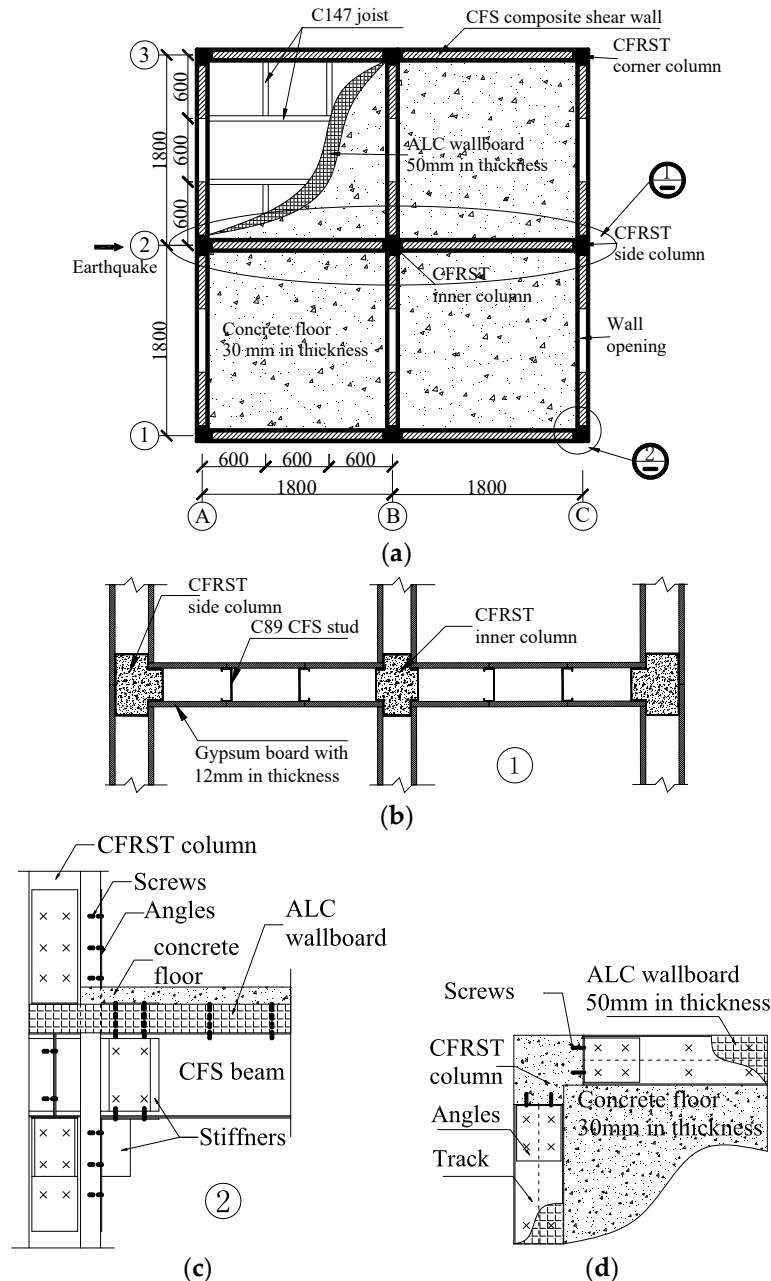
Details of the floor, shear wall, and beam–column joint (Unit: mm). (a) Layout of the floor system; (b) Layout of the partial shear wall ①; (c) Elevation of the corner column joint ②; (d) Planar of the corner column joint ②.
